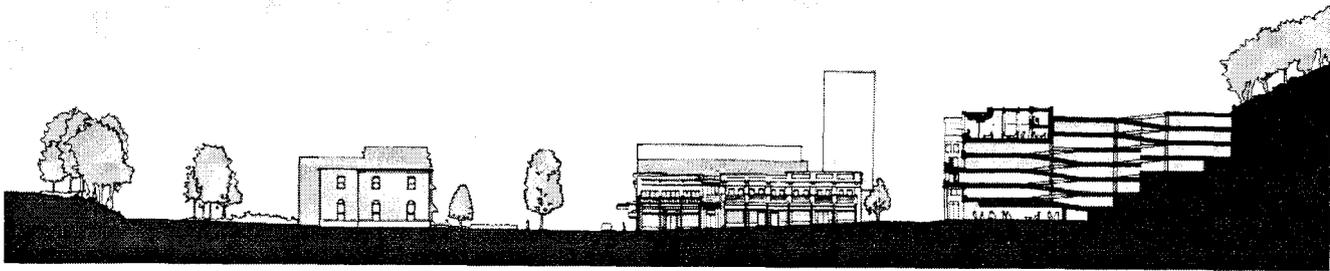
East West Section through the main plaza, mixed used structure and West Mountain to the right.
